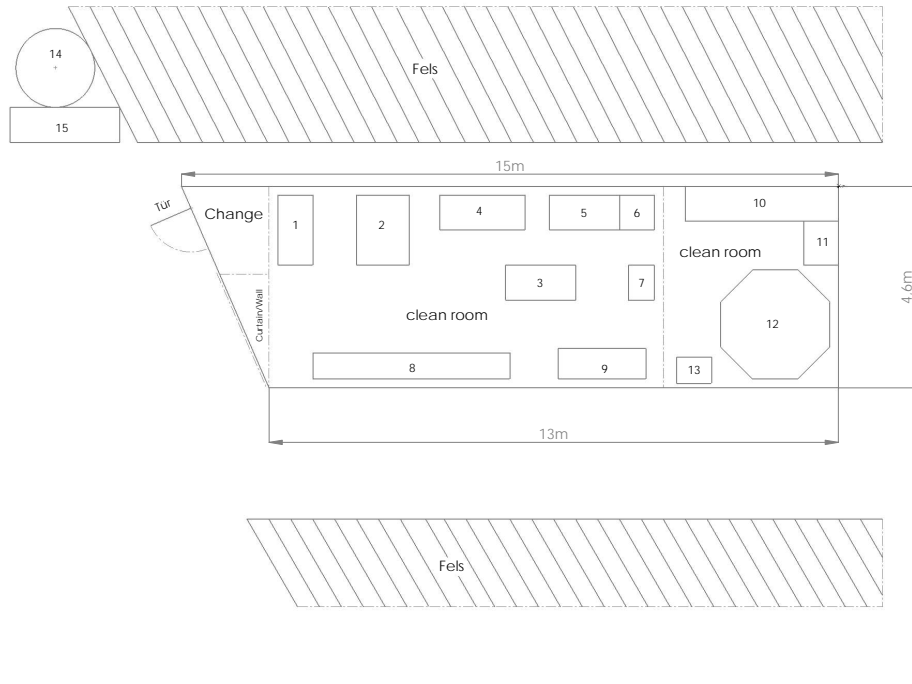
Floor plan of the LARGE barrack. Explanations cf. text.
